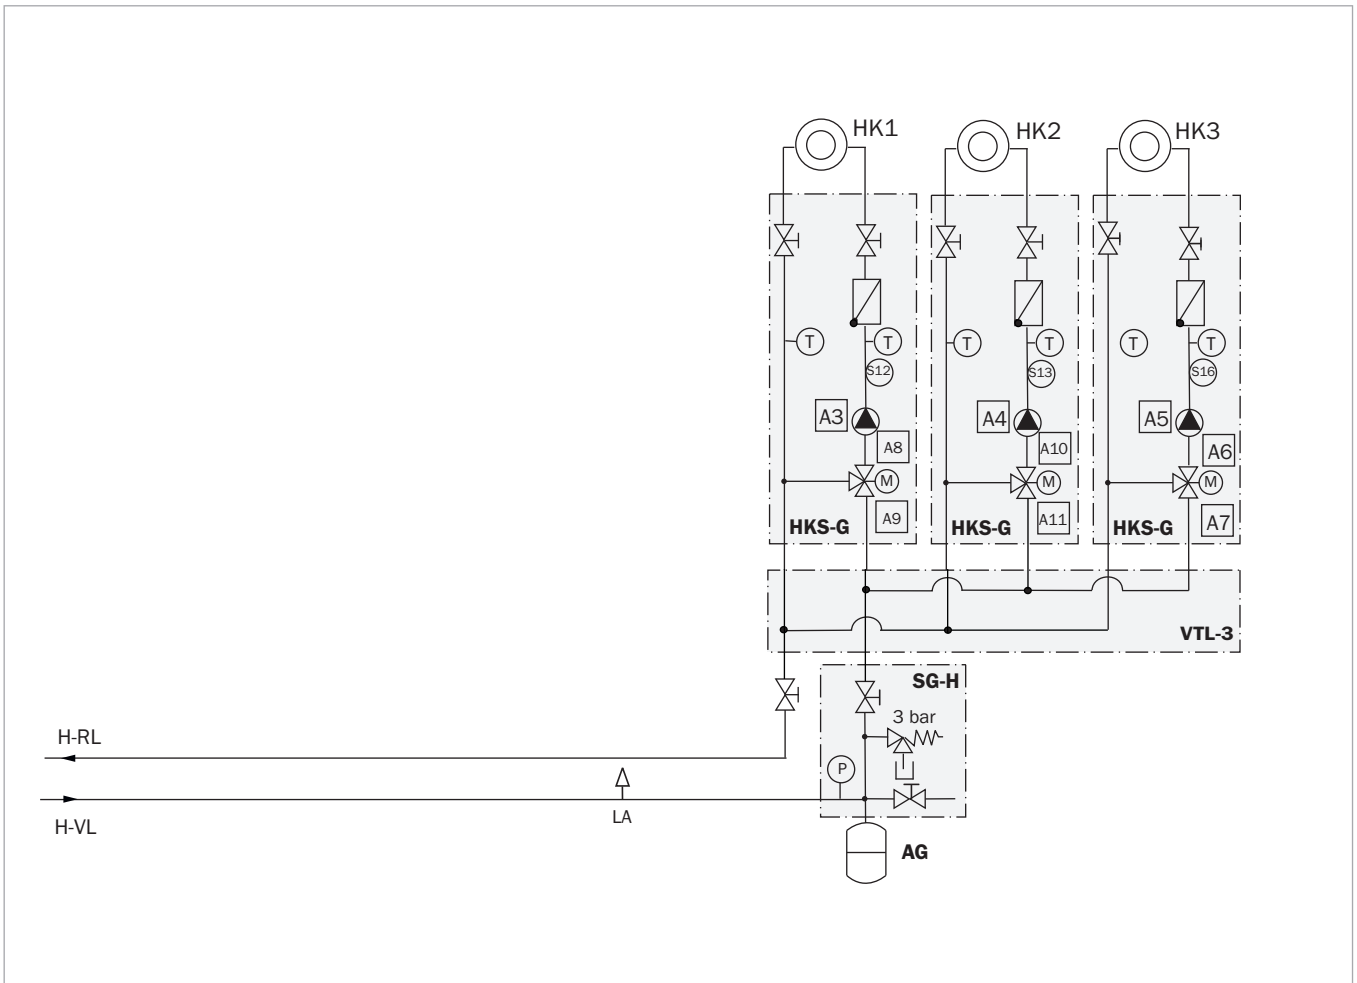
SolvisMax series 6 basic equipment with SC-3 and three heating circuits - part 2
